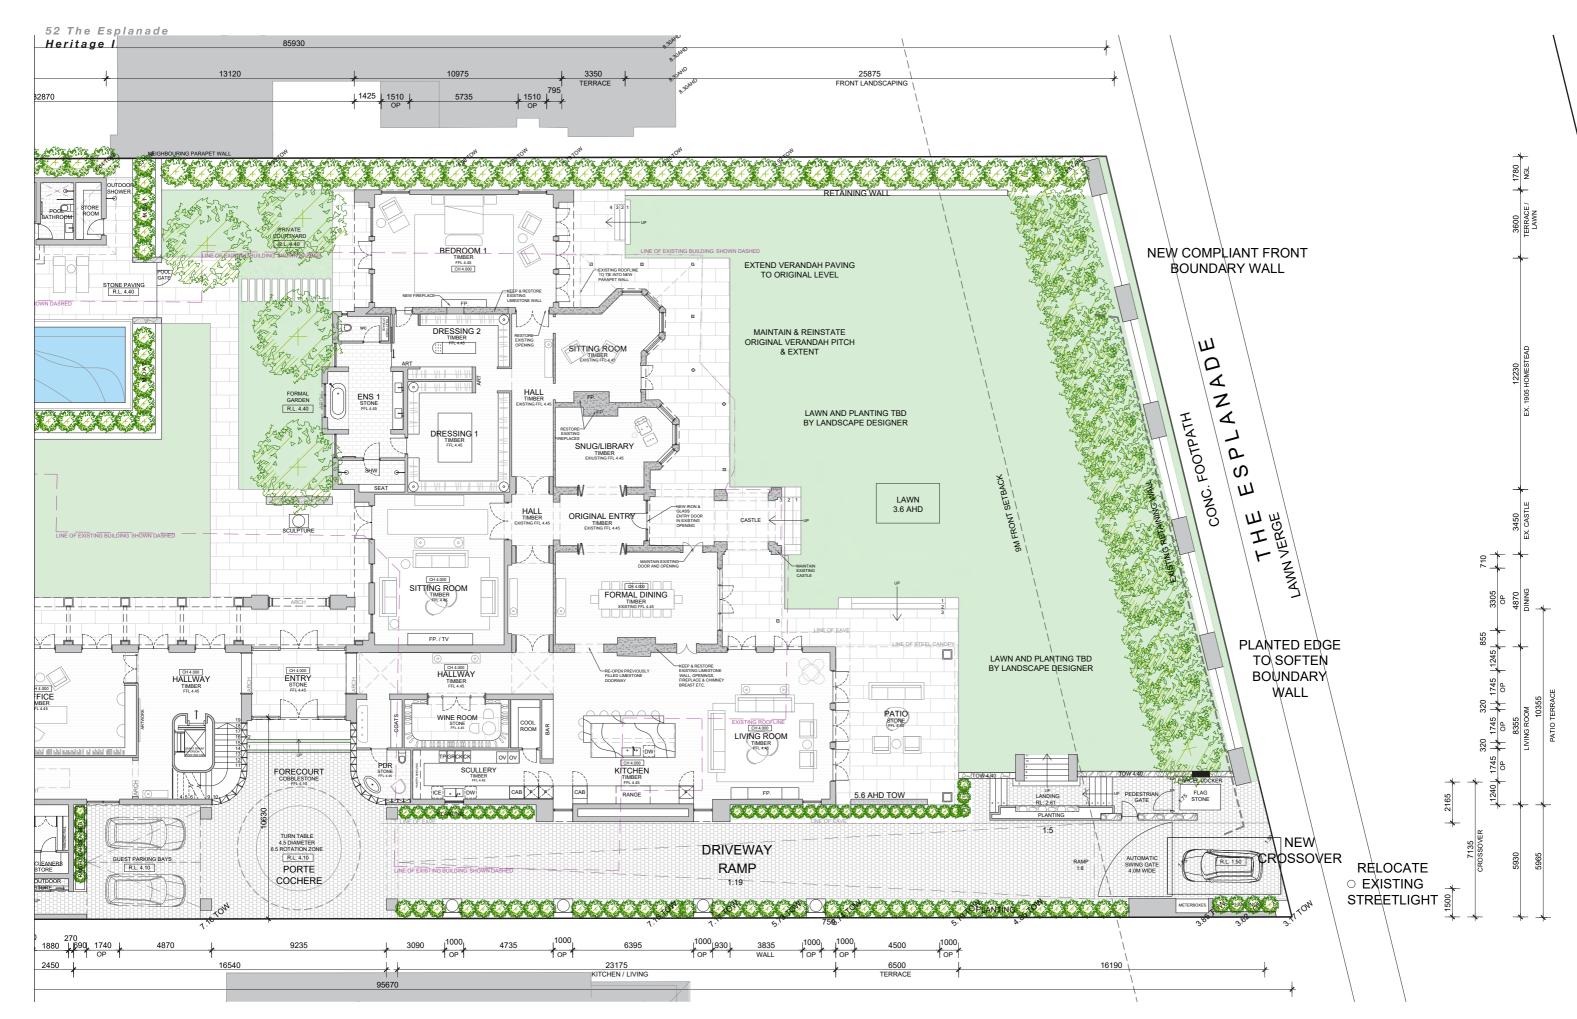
52 The Esplanade, Proposed Ground Floor Plan. (Source: Philippa Mowbray Architecture & Interiors 2023)
